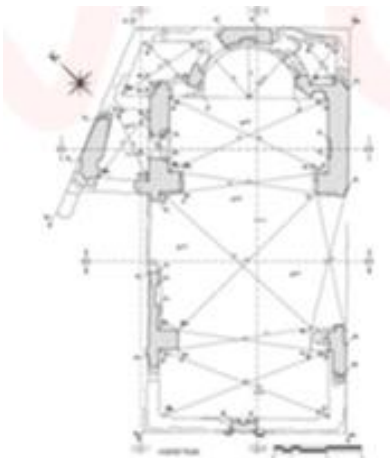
Surp Lusavoriç Church Survey Plan (Spor, 2020)
